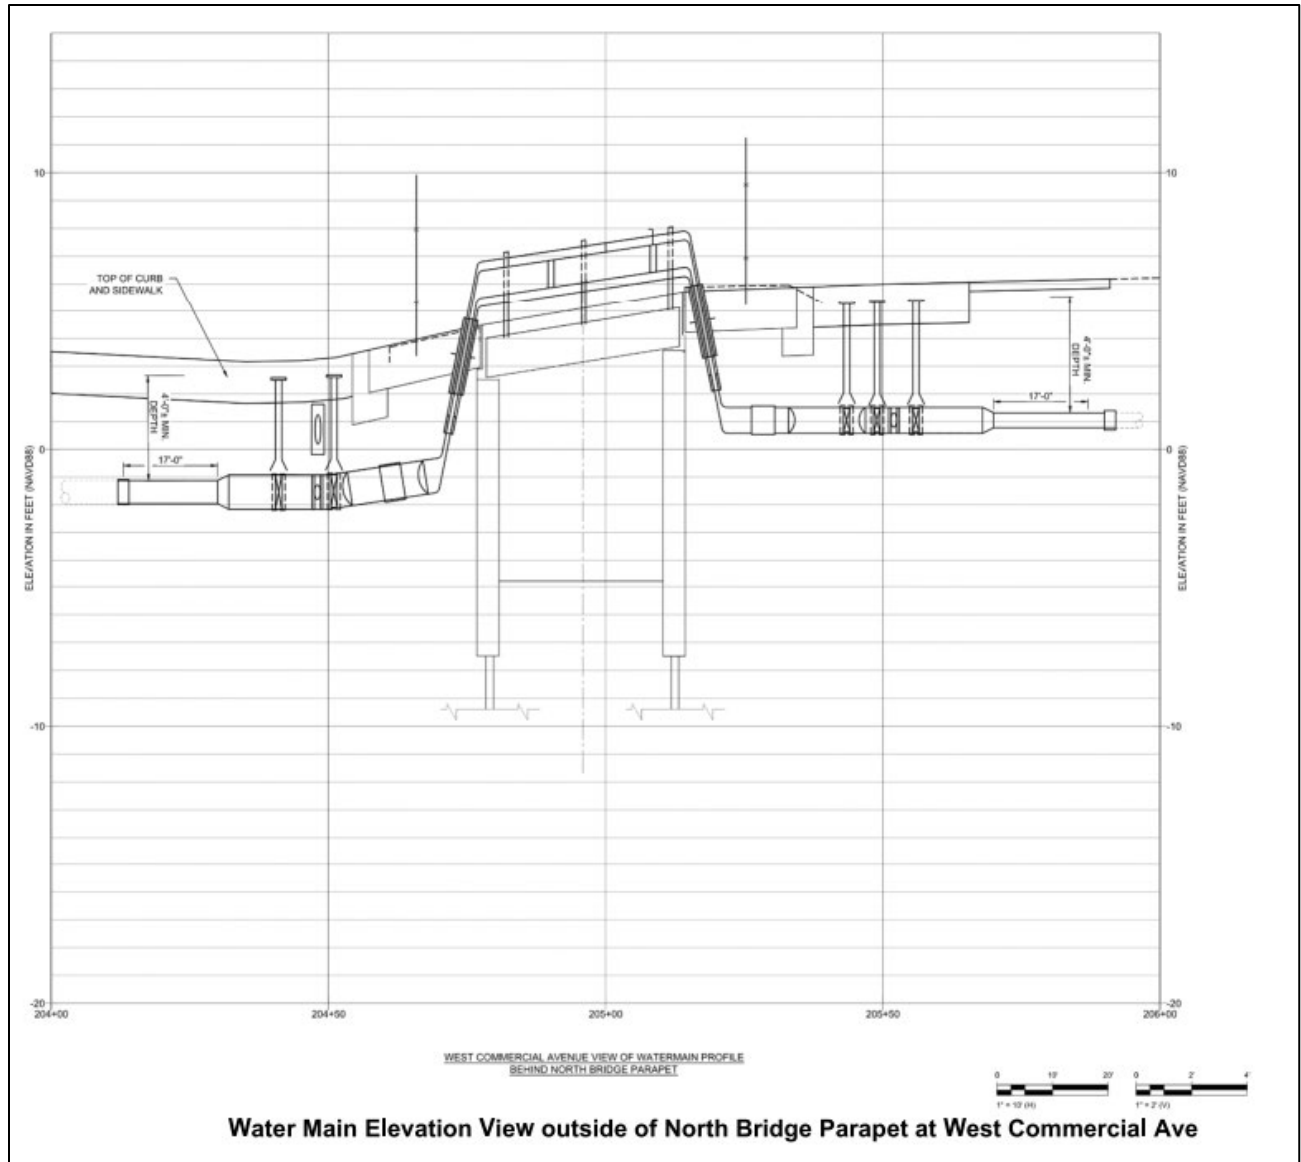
Water Main Elevation outside of North Bridge Parapet at West Commercial Avenue
